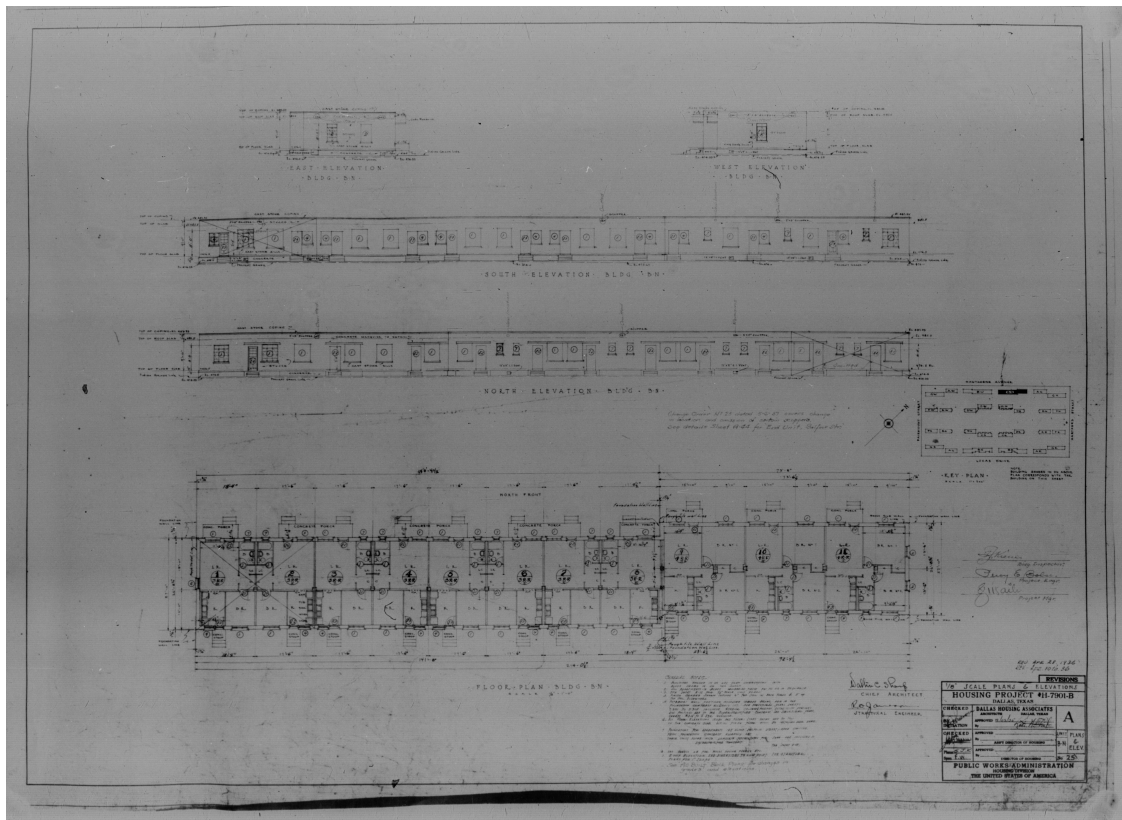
A. Dallas Housing Associates. “South Elevation” and “North Elevation” Drawings (Single-story structures). Architectural drawings. Public Works Administration (25 December 1935). H-7901-B. Record Group 196: PWA 1933-36. National Archives at College Park, MD.
